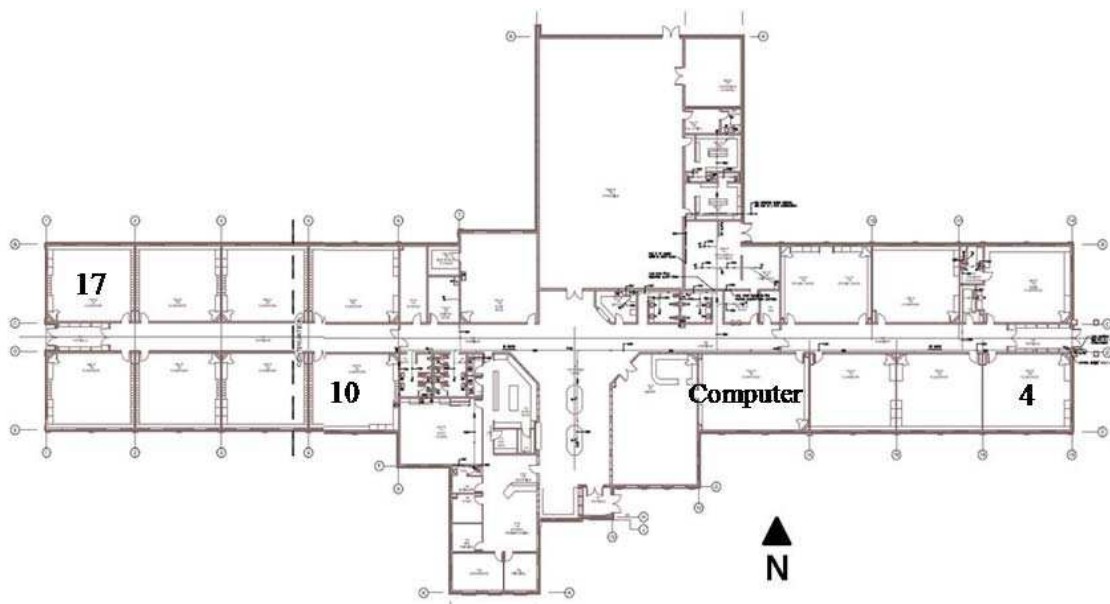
Plan of Calmar School - monitored classrooms (numbered rooms) and computer room.
